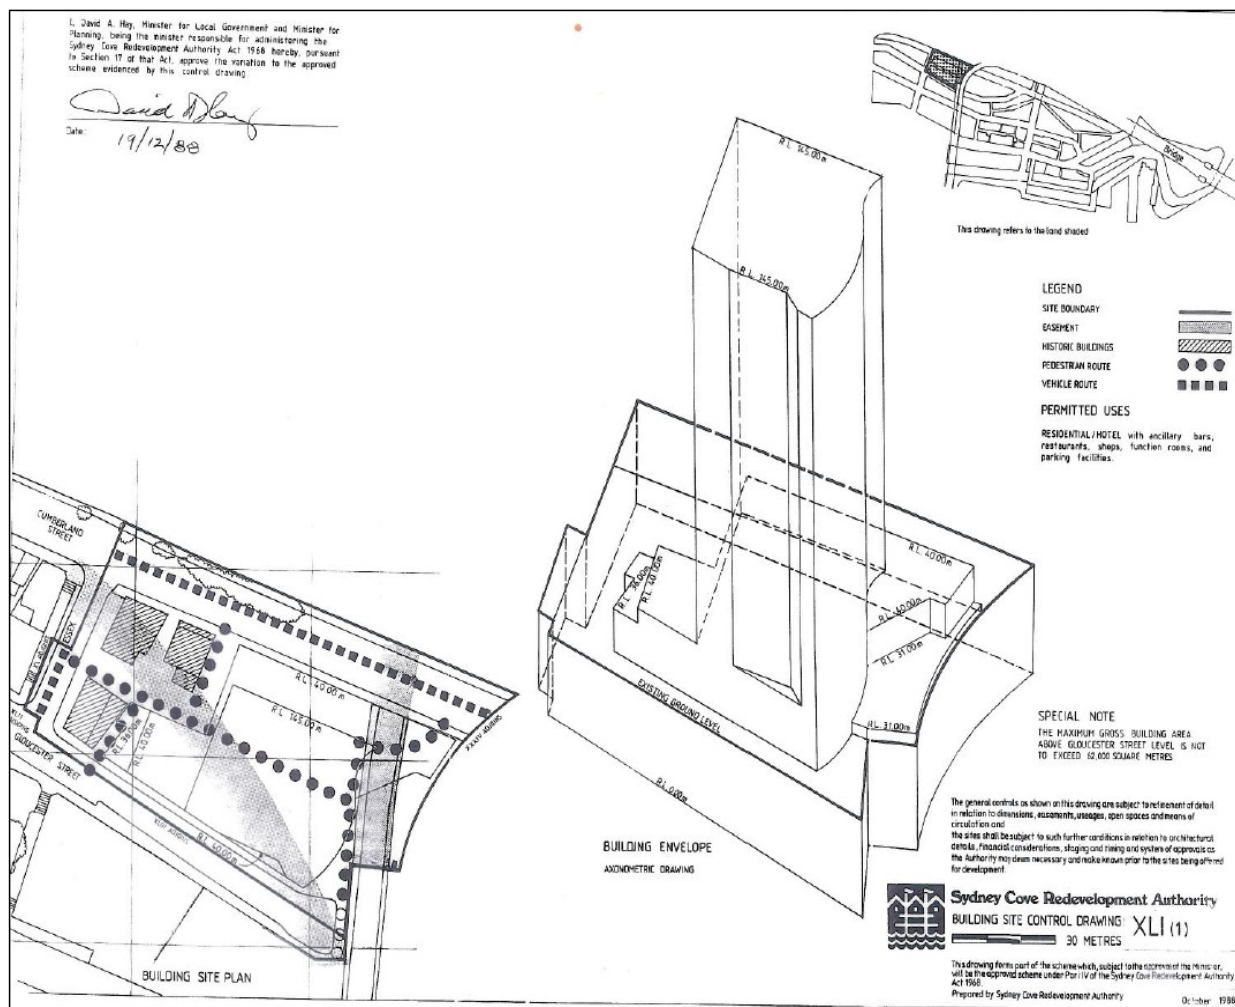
SCRA Building Site Control Drawing XLI (1) showing the neighbouring building envelope and permitted uses. (Source: SHFA)
